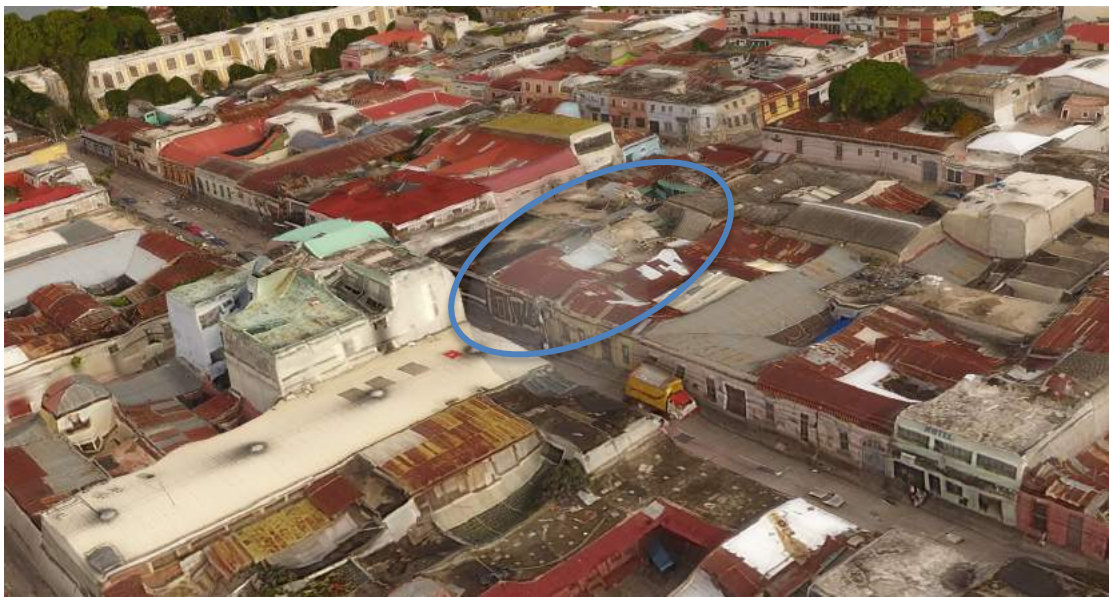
Building 1: Drone 3D model - Colegio Mixto Santa Sofia from the south east
